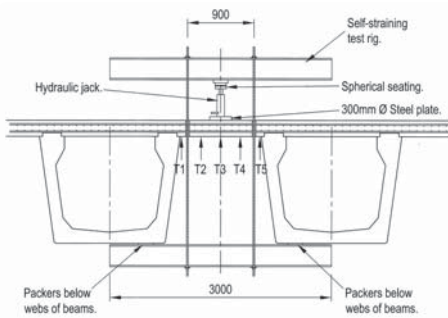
Bridge deck cross-section and typical test arrangement for slab between W beam.
